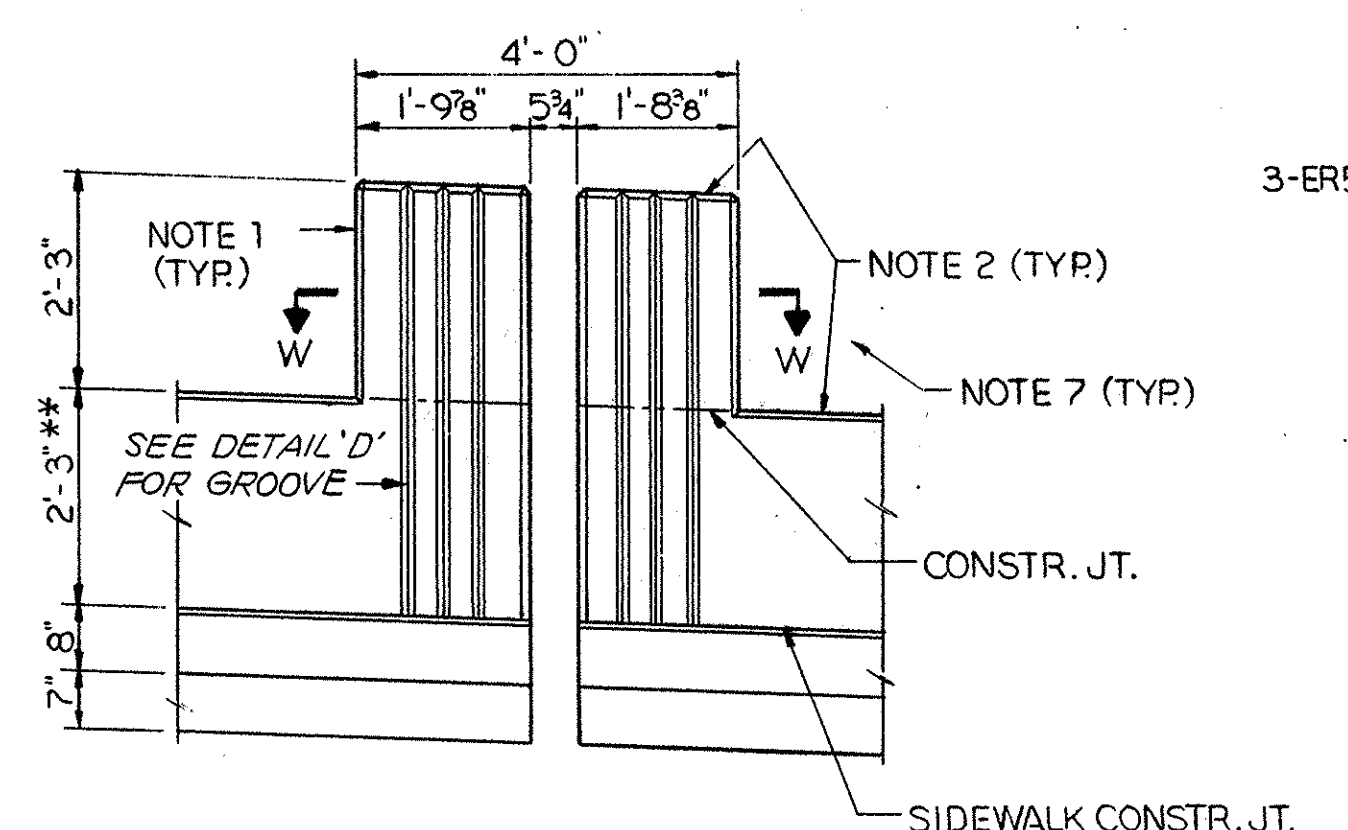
DETAIL 'G' OPPOSITE HAND AND AS NOTED
